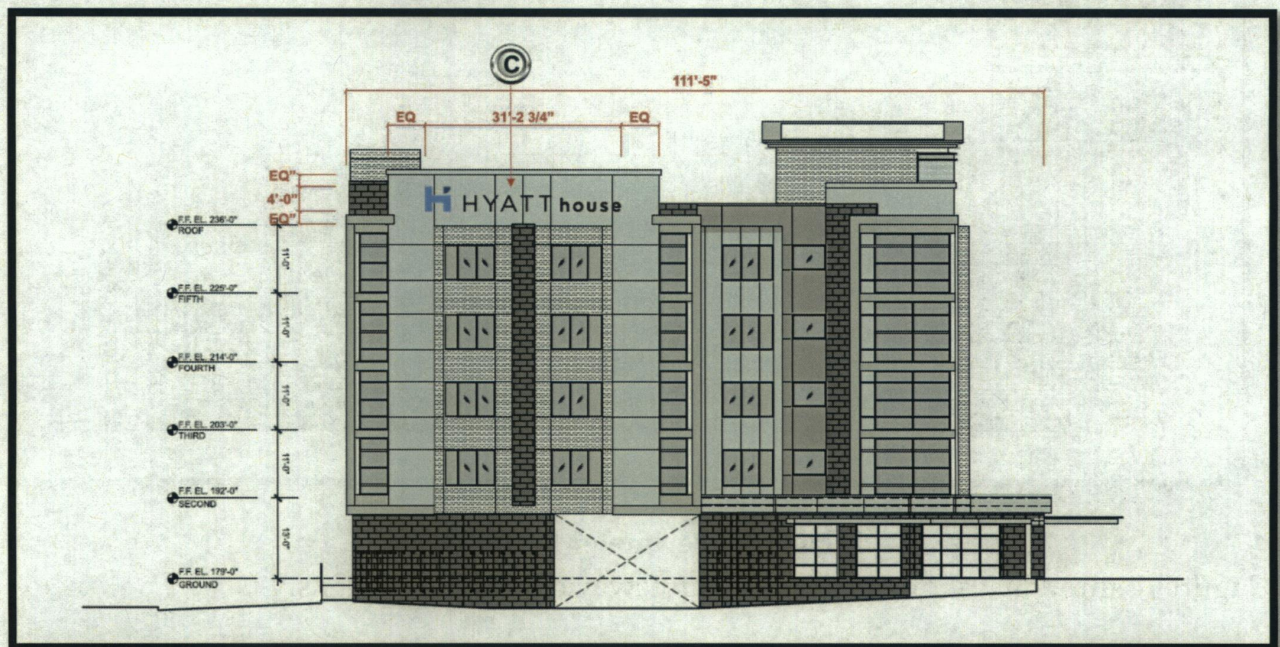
Freeway Oriented Wall Sign (Facing N. Wolfe Road On-Ramp / I-280)
